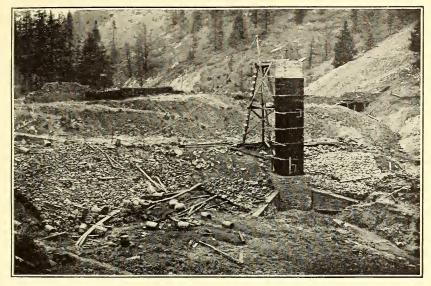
OUTLET TOWER AND EMBANKMENT OF MYSTIC LAKE DAM, MONTANA, UNDER CONSTRUCTION.
